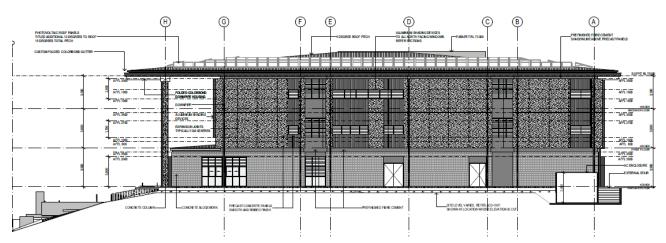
Eastern Elevation (Binalong Road) Source: Architectural plans prepared by Fulton Trotter Architects, March 2021.
